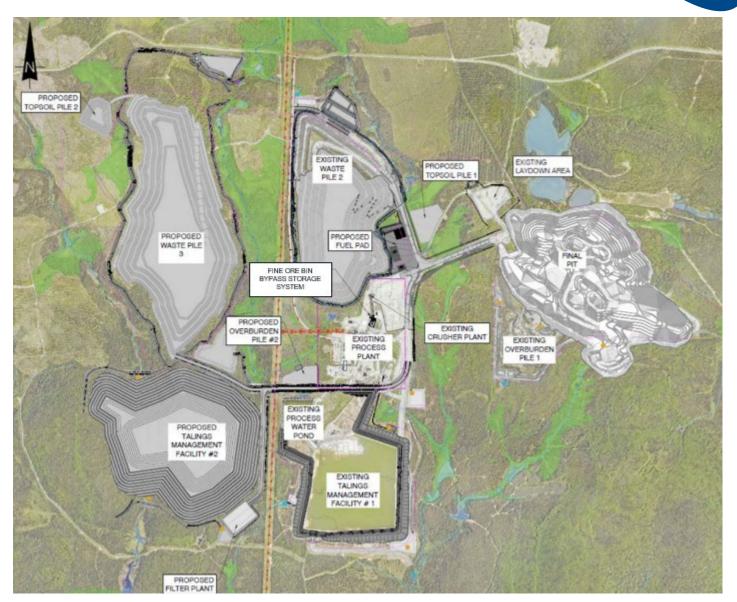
NAL Site Layout Schematic (DFS 2023)
